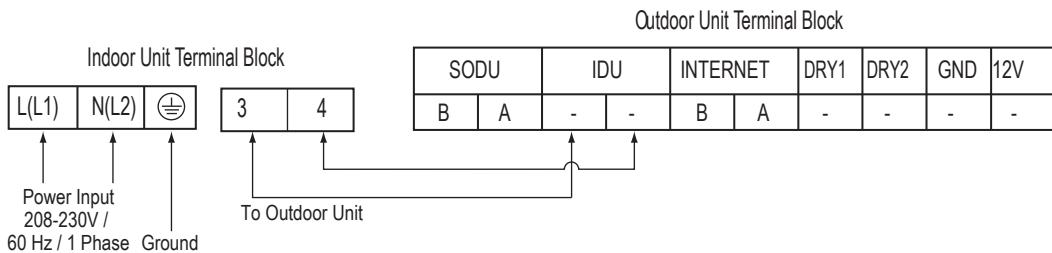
Simplified View of Indoor Unit Terminal Connections—SJ and SK Wall-Mounted Frames.
